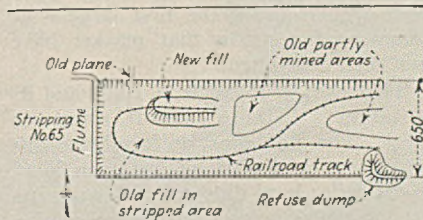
Plan, Shaft Pillar Stripping in Morea Basin; Will Eventually Be 220 Ft. Deep.
